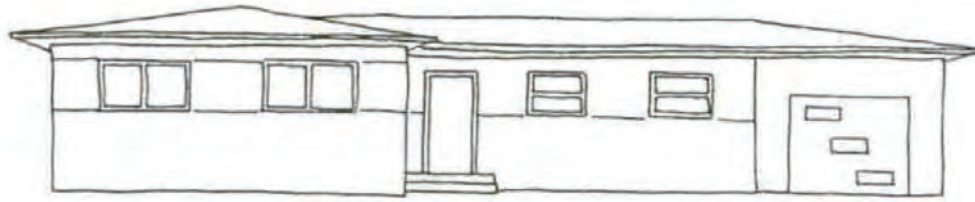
Facade Conditions from Modern / Ranch Styles
